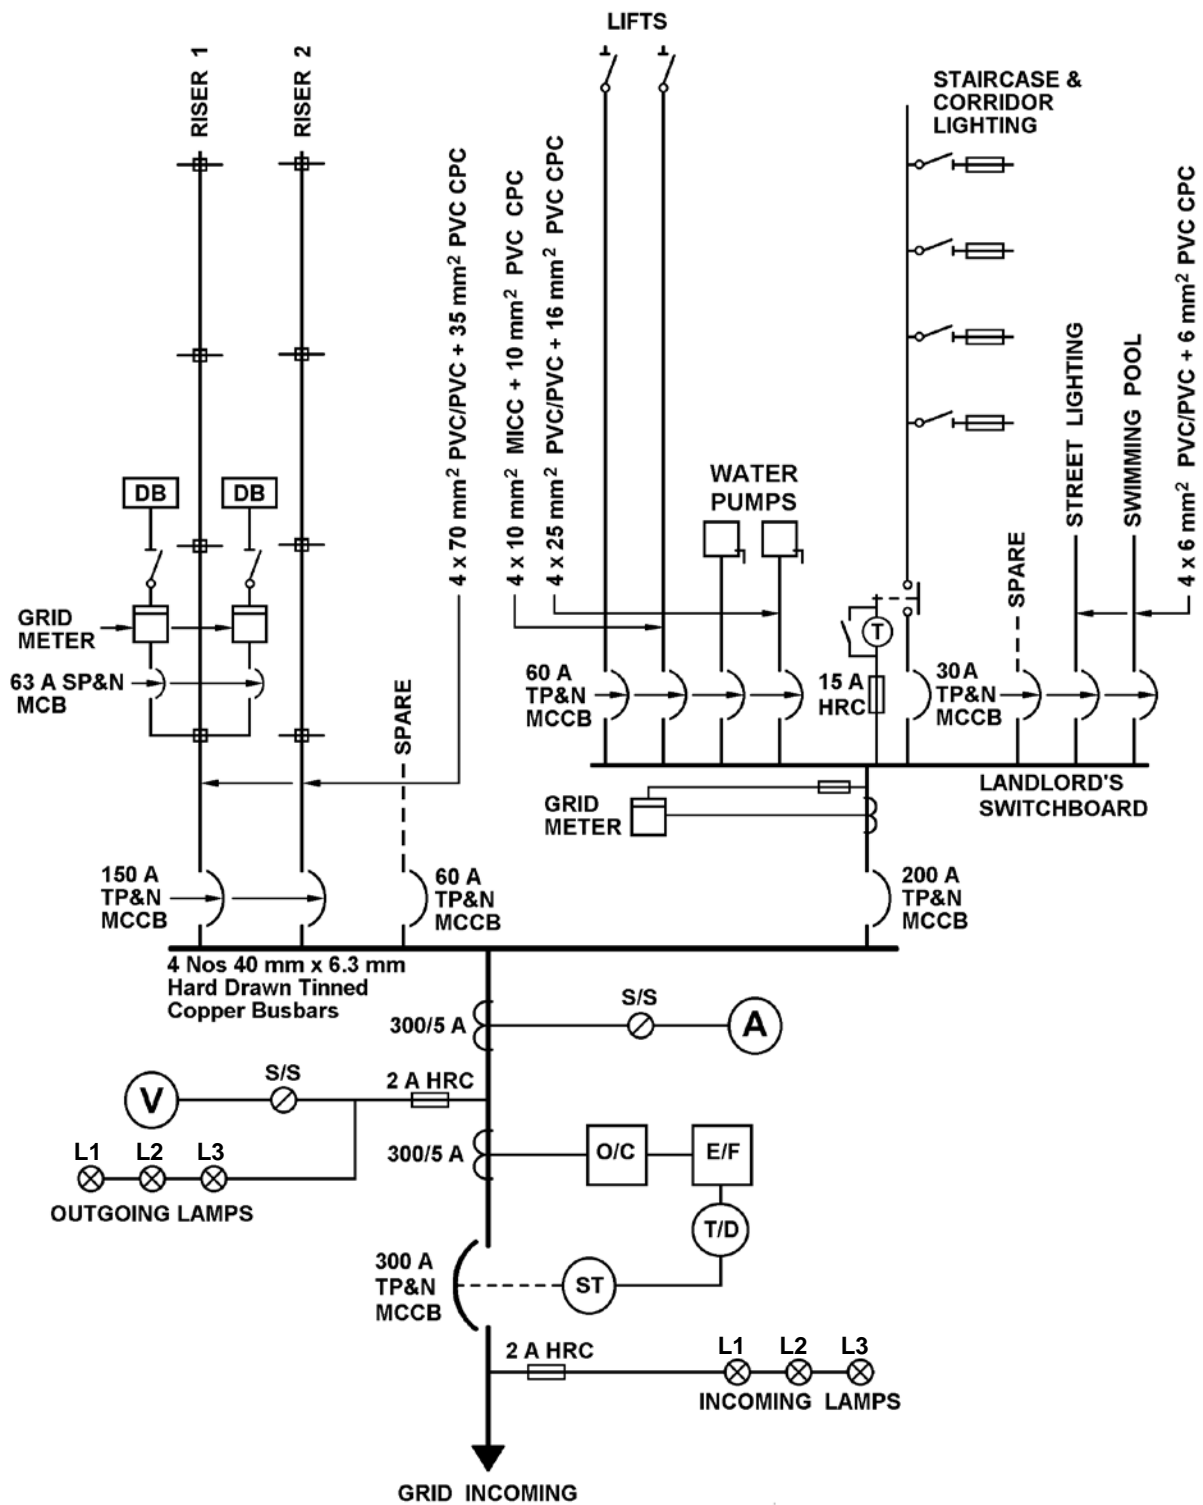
2 Typical Single-Line Diagram of Electrical Installation to block of Flats (Condominium)
